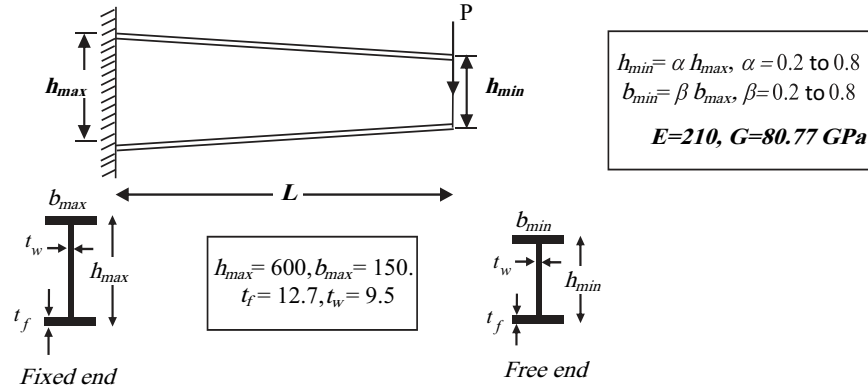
Tapered I-section cantilever beam: geometry, material and loading properties.
